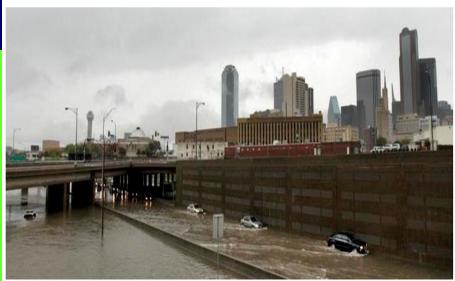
R.L. Thornton Freeway (IH30) "Canyon" at South St. Paul Street, Able Sump Area - March 19, 2006 (source: Dallas Morning News)
